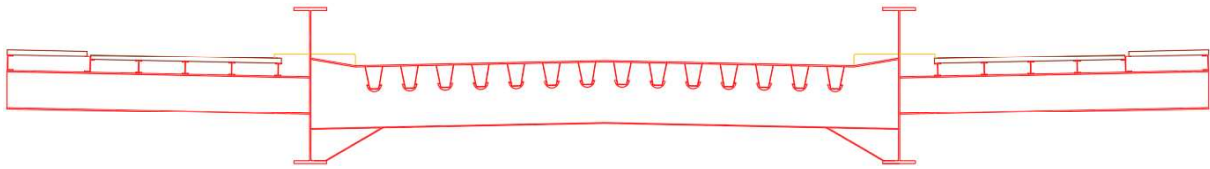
, Cross section base variant, with a steel orthotropic RD and wooden FCP.
